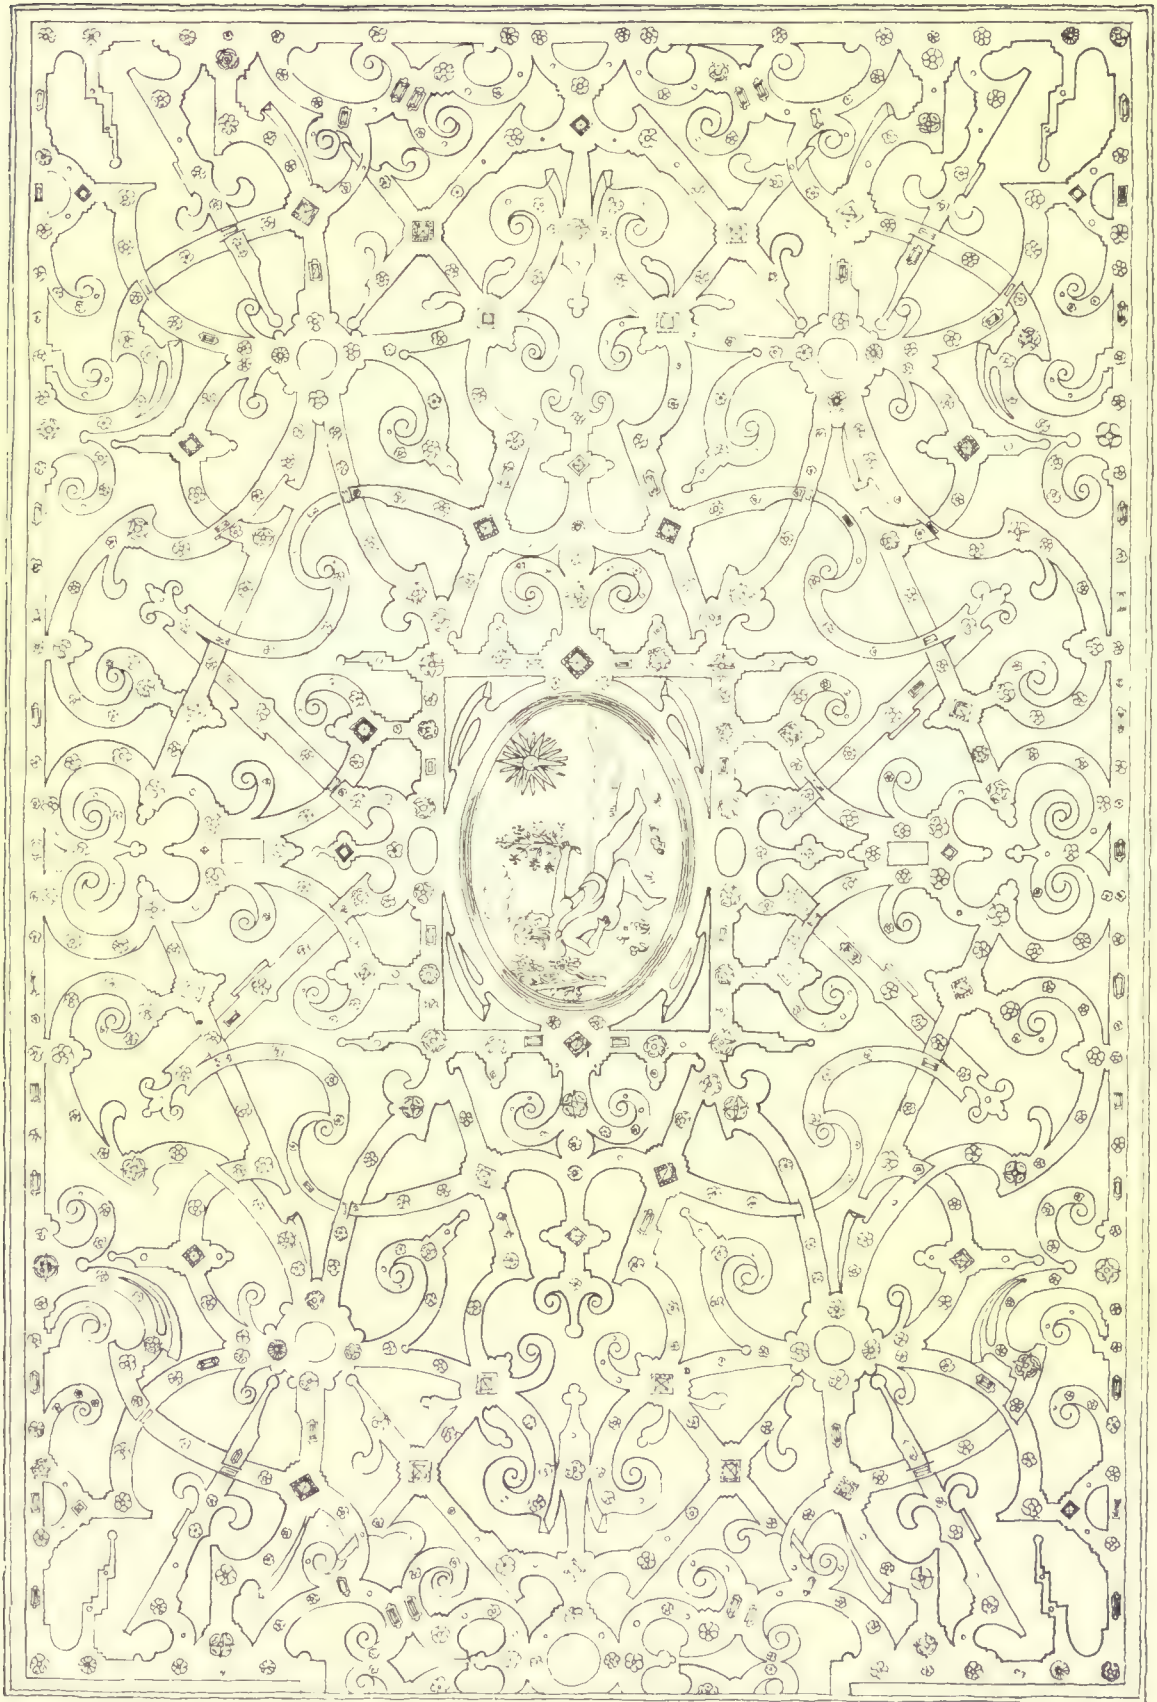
Half of Strap-work Ceiling, Audley End.
